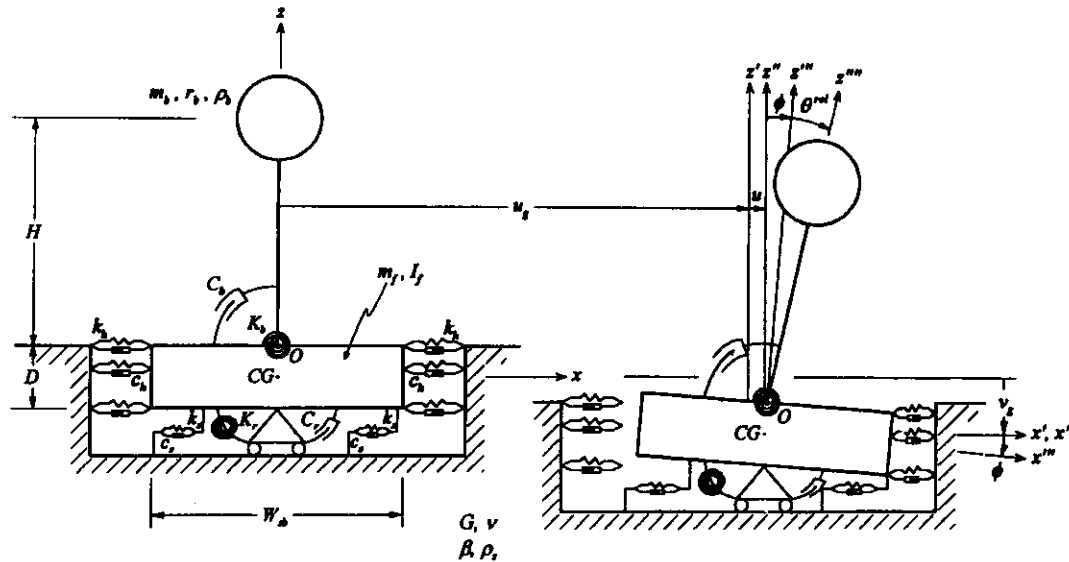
A model of a soil-foundation-building system in an undeformed (left) and a deformed (right) configuration
